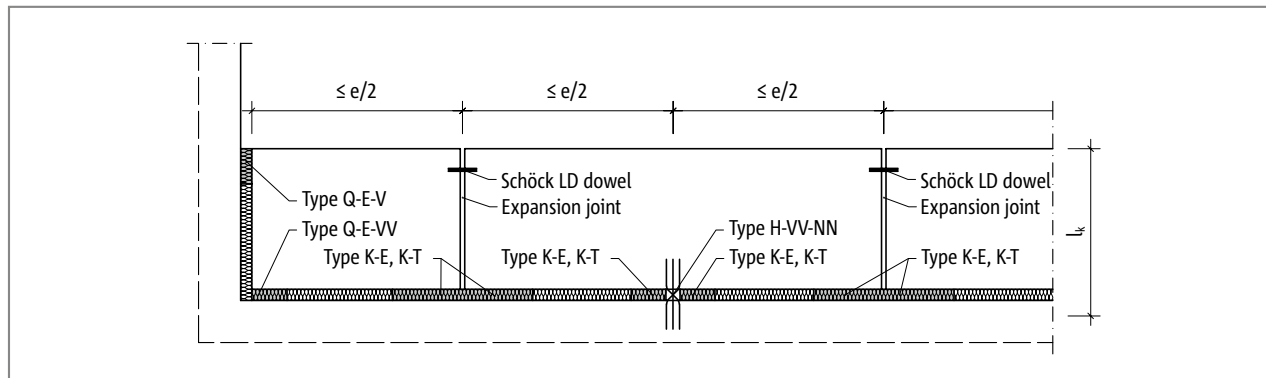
Schöck Isokorb® T type H: Expansion joint spacing
